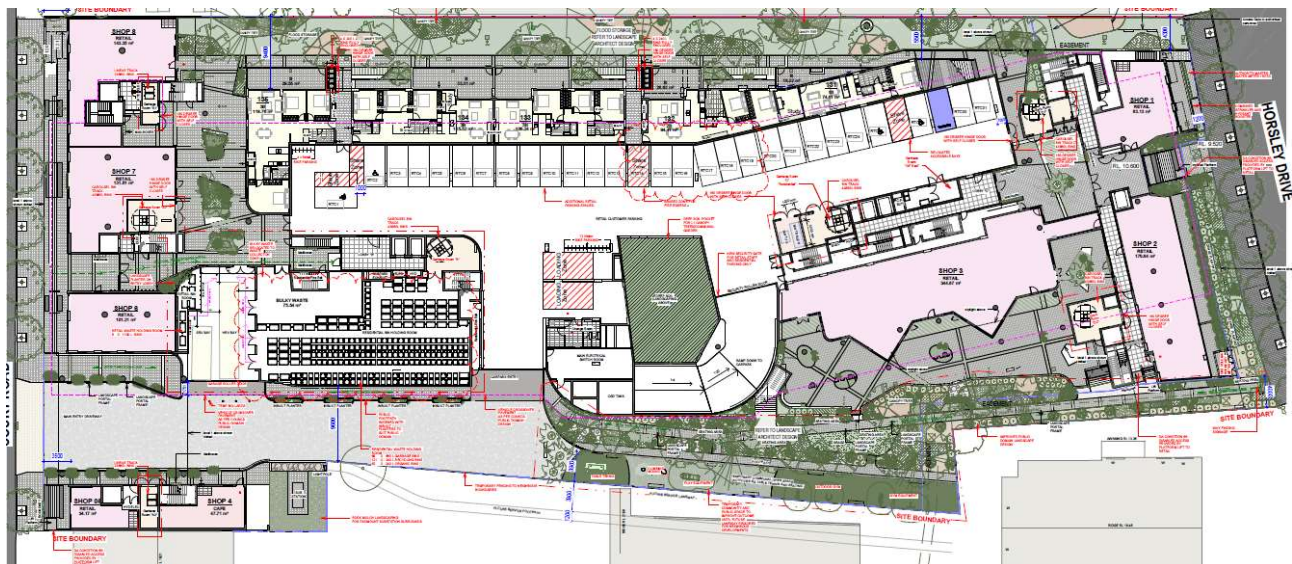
Proposed ground floor plan seeking changes to the loading, waste management areas, improving site-through links, adjustments to parking layout.
